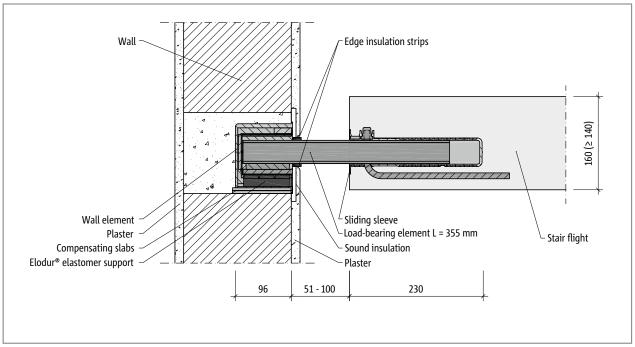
Schöck Tronsole® type Q-FV-XL or Q-A2-XL: Installation cross-section with precast stairs flight
